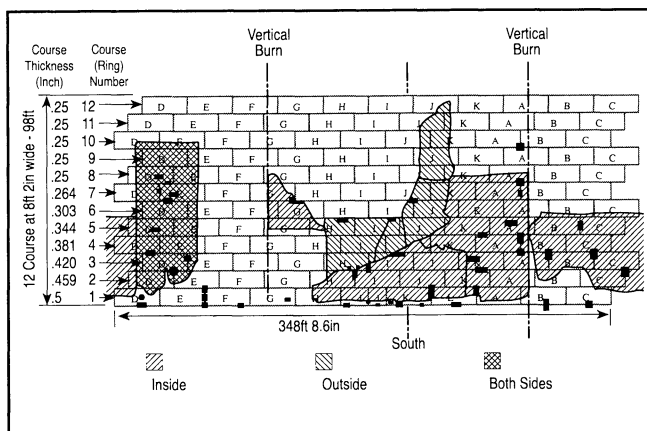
Tank T-1, Wall showing the individual plates from the floor to the knuckle. Cross-hatched sections show pieces removed from wall which were inspected by MRL.
